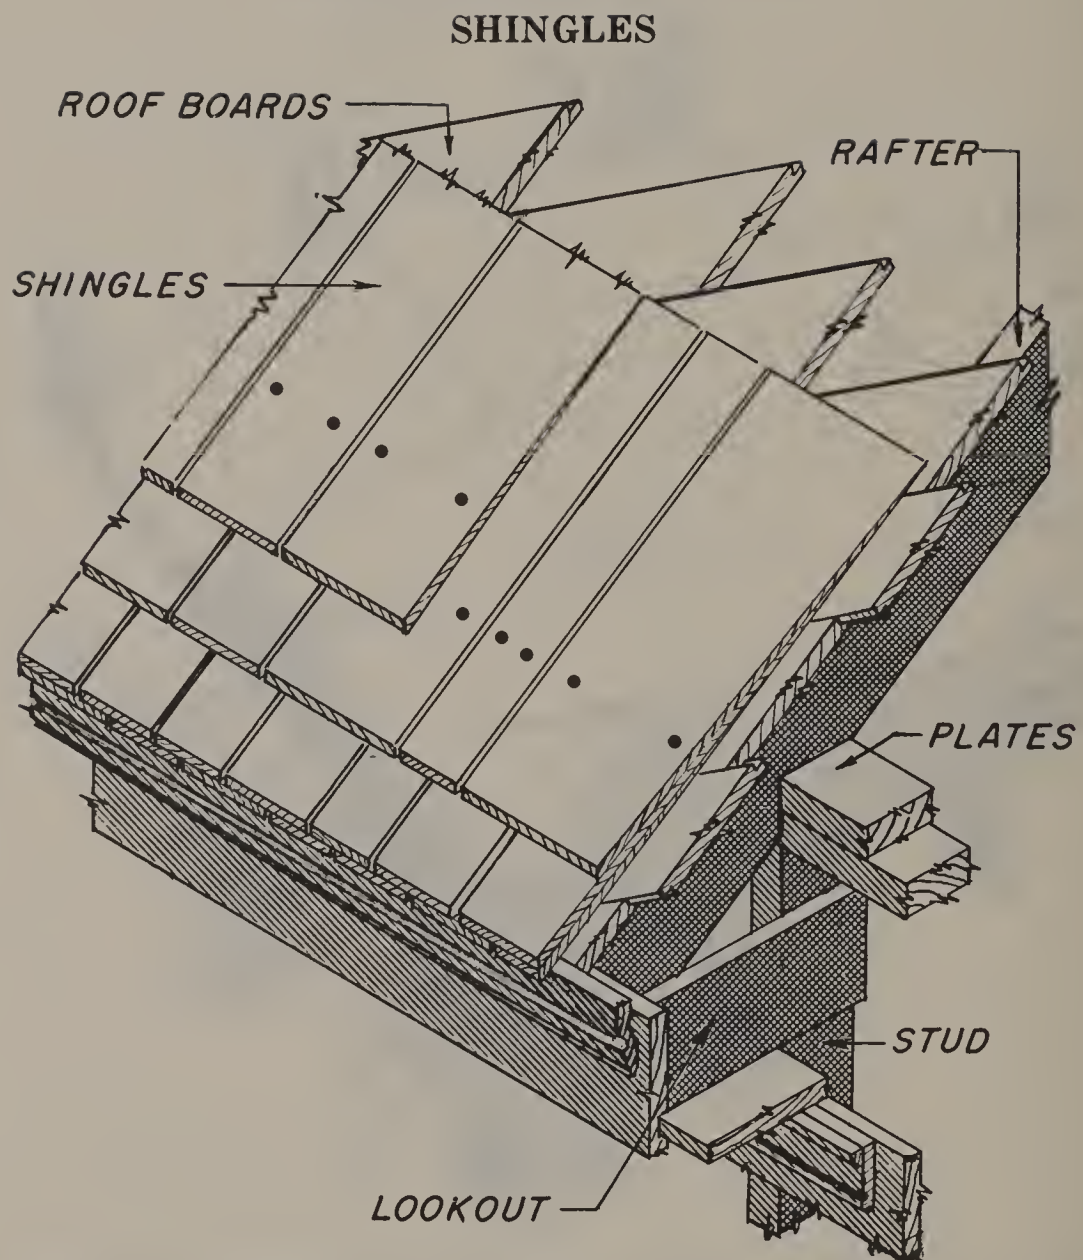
Wood shingles. Nail 1 inch above exposure line and three-quarter inch from edge of shingle with rust-resisting nails long enough to penetrate through sheathing. Nails driven flush with face of shingles. Note: Shingles wider than about 8 inches should be split and nailed as two shingles.
